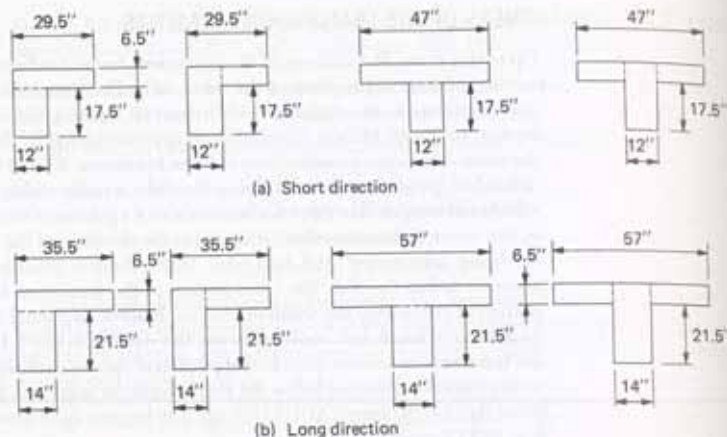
Effective cross-sections of transverse beams resisting torsion, in two-way slab (with beams) design example.
